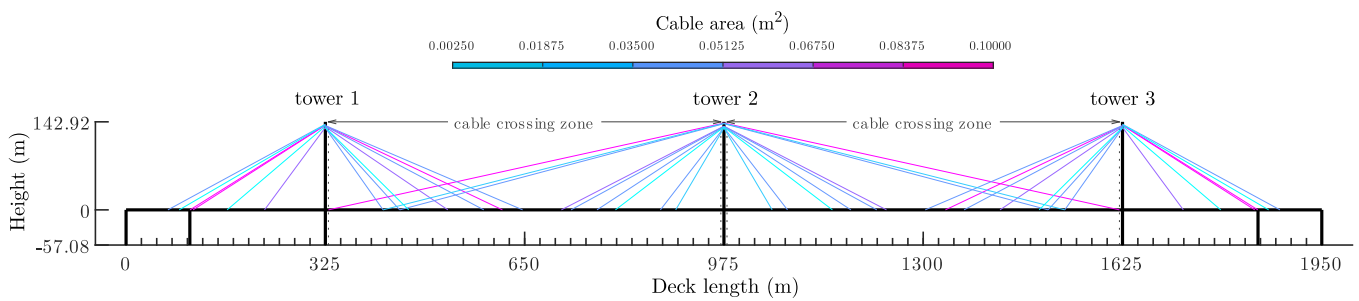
Optimum cable layout and cross-sectional areas without considering cable breakage (intact model optimization).
